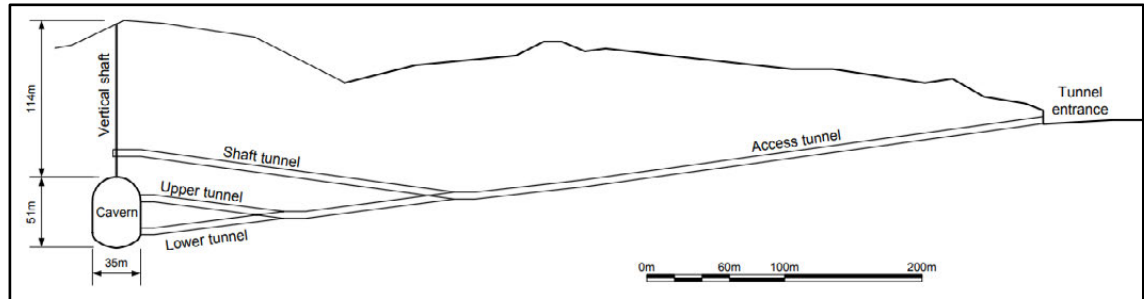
Layout of storage cavern and access tunnels at the LRC Demo Plant (Mansson, Marion et al. 2003)
